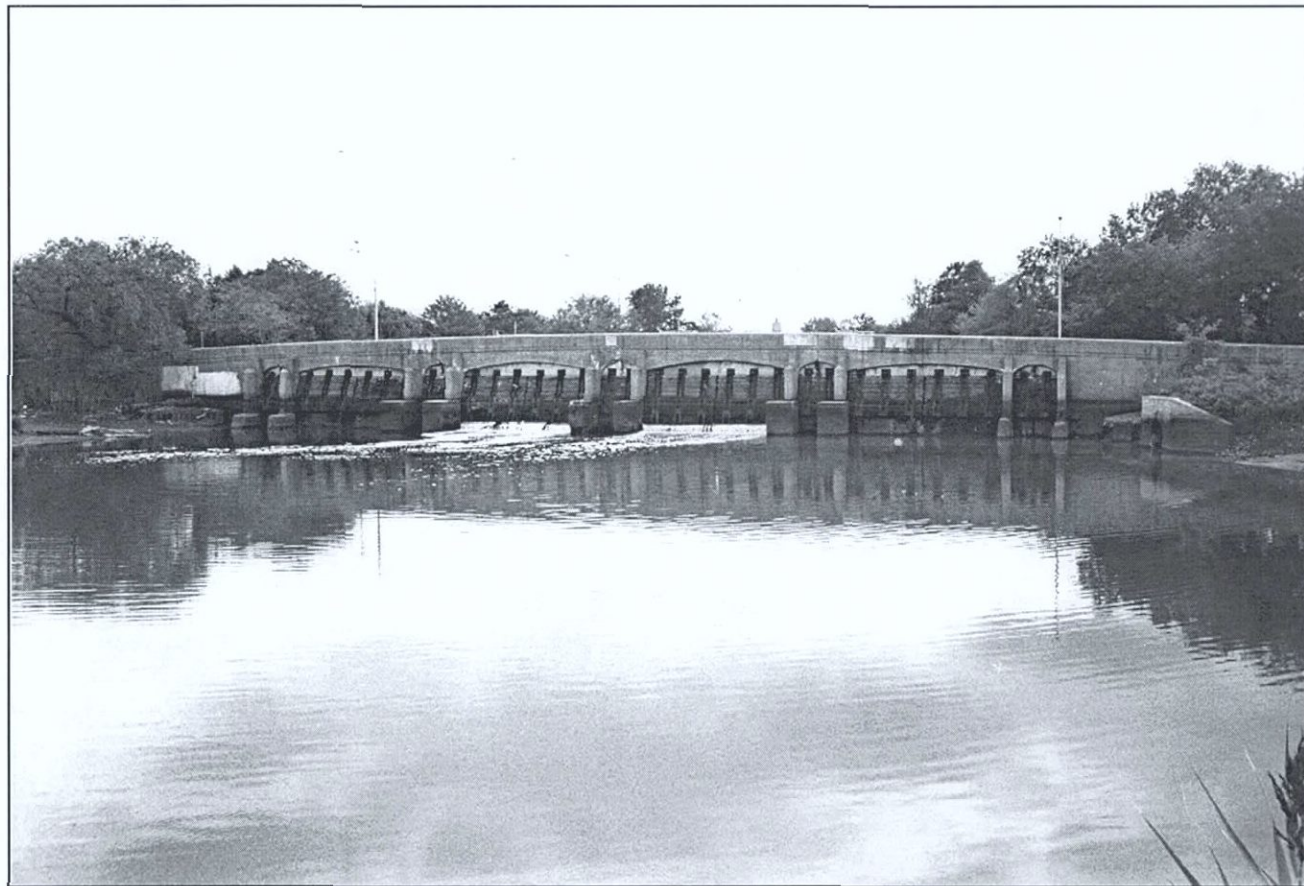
Porpoise Bridge and outfall (at center right), facing south from LIRR embankment. Flushing Bay Ecosystem Restoration Project, Queens County, New York (Pickman 2002).
